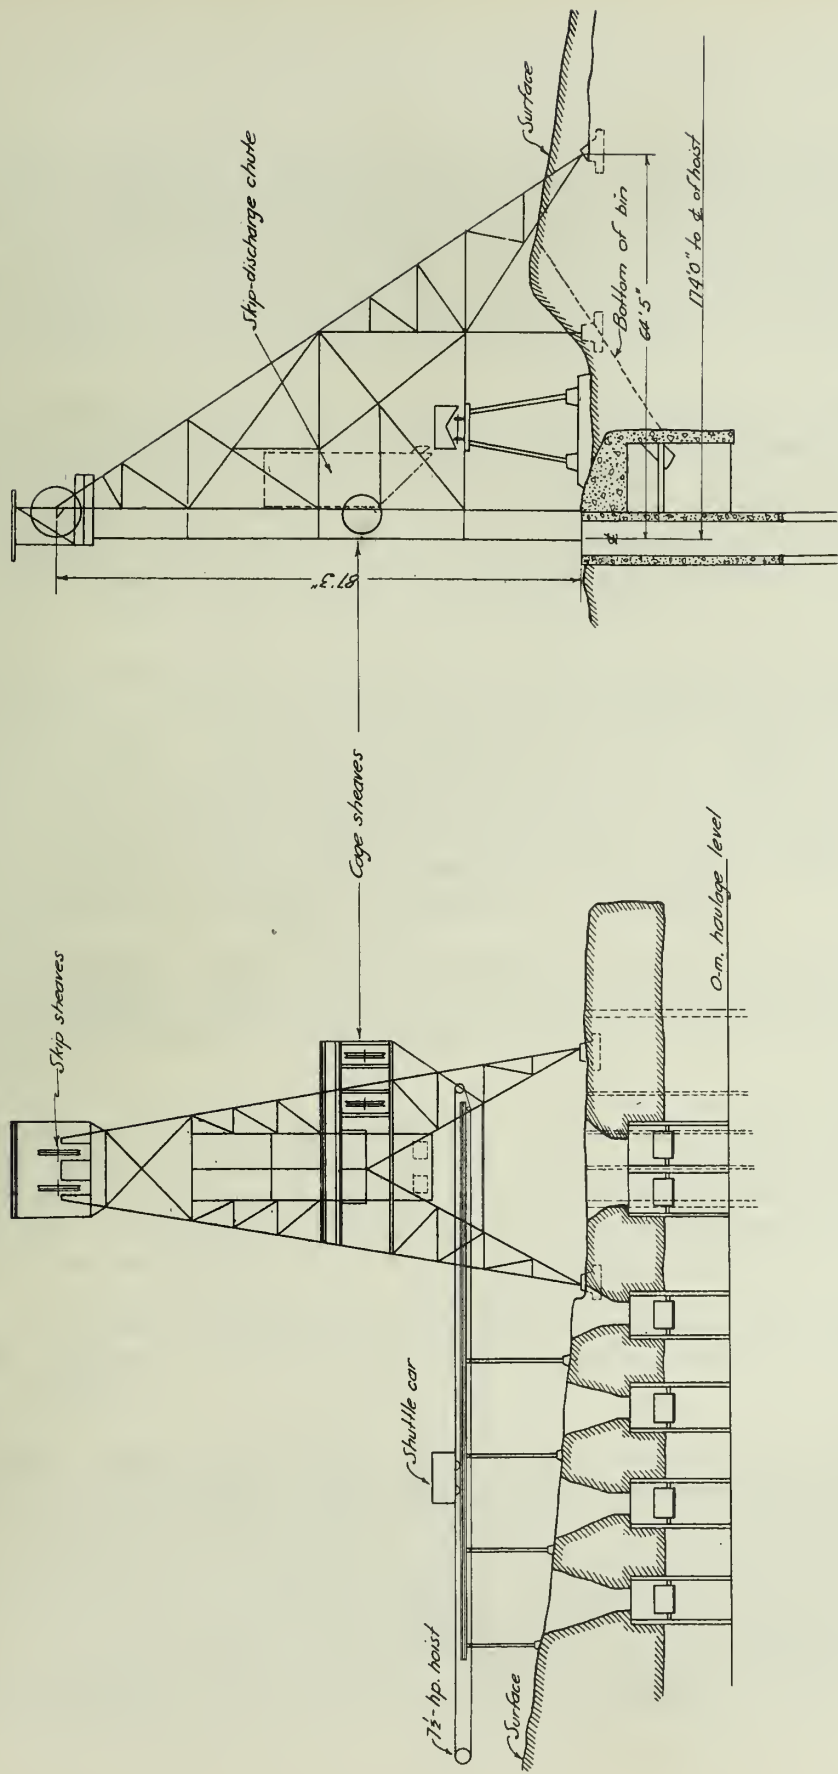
Front and side elevations at General shaft, showing headframe and arrangement of loading bins
